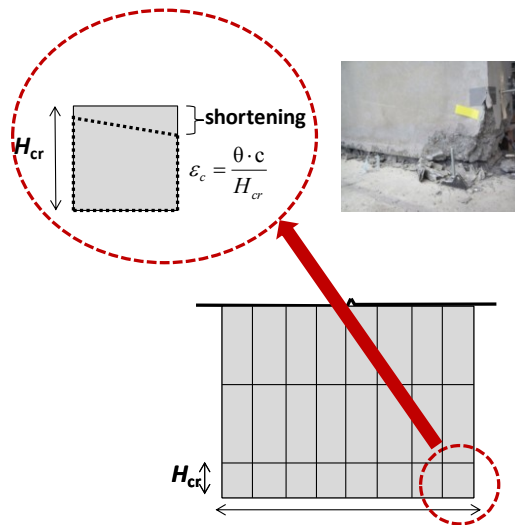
Concrete strain at extreme compressive fiber at wall toe
